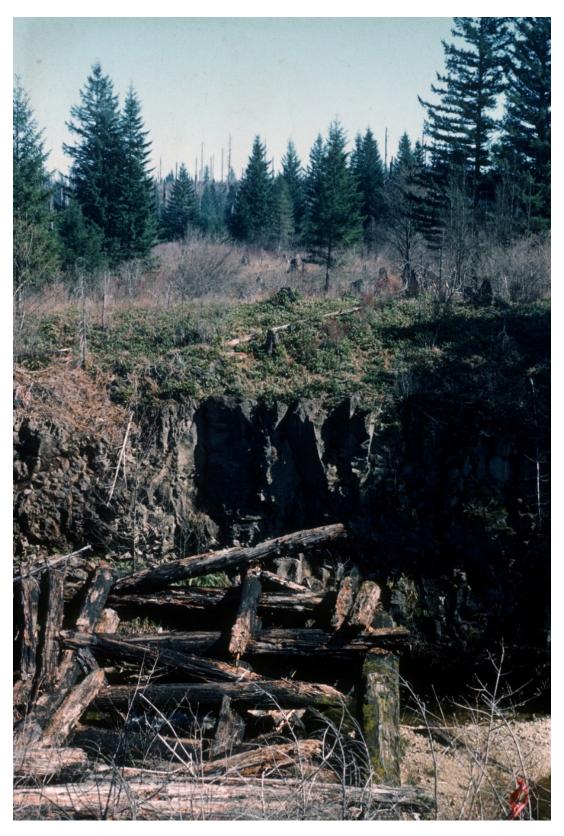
Historical photo of the remnant splash dam at the site of what would be Kwoneesum dam. Photo credit - Courtesy of Nancy King, Camp Fire Columbia
